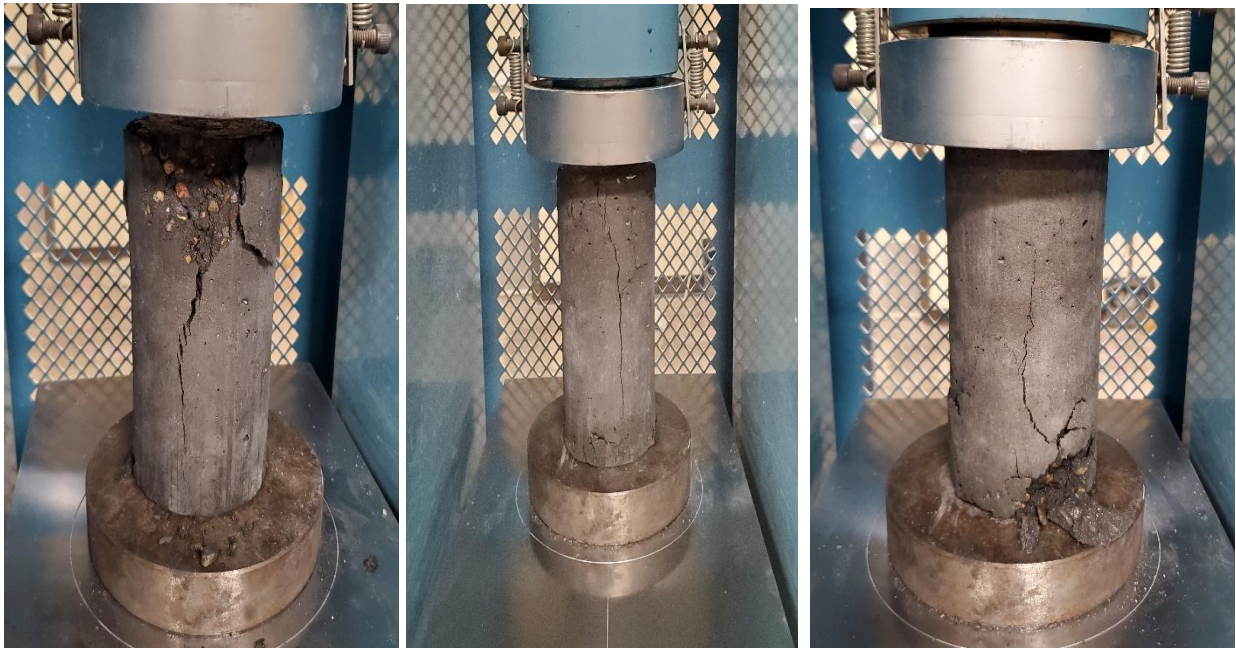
Failure of specimen 10T1, 10T2 and 10T3 under lateral loading
